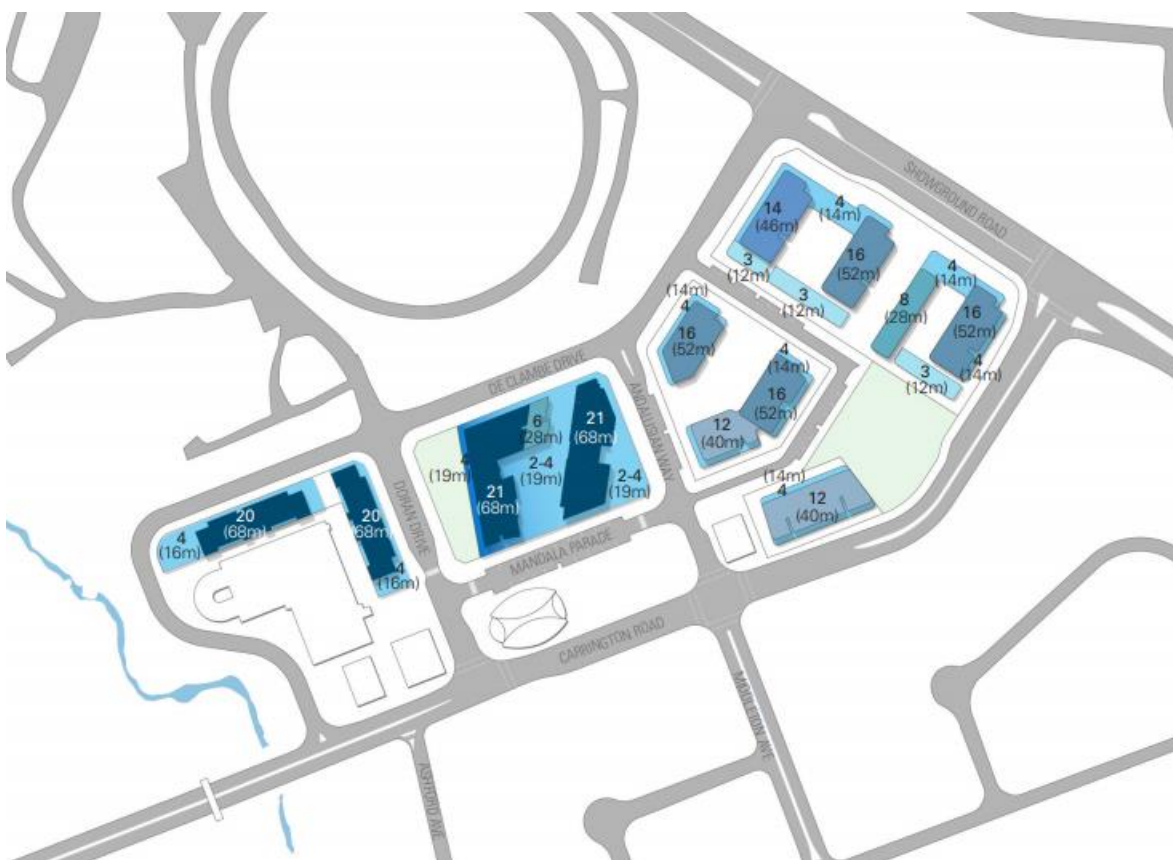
Height Plan - revised concept proposal (Cox Architecture, 2020)
